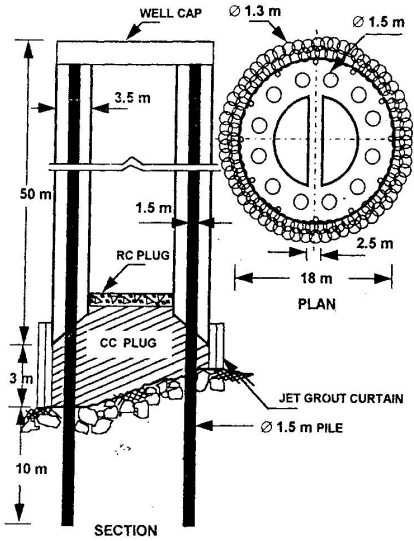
JOGIGHOPA BRIDGE FOUNDATIONS 17, 18
